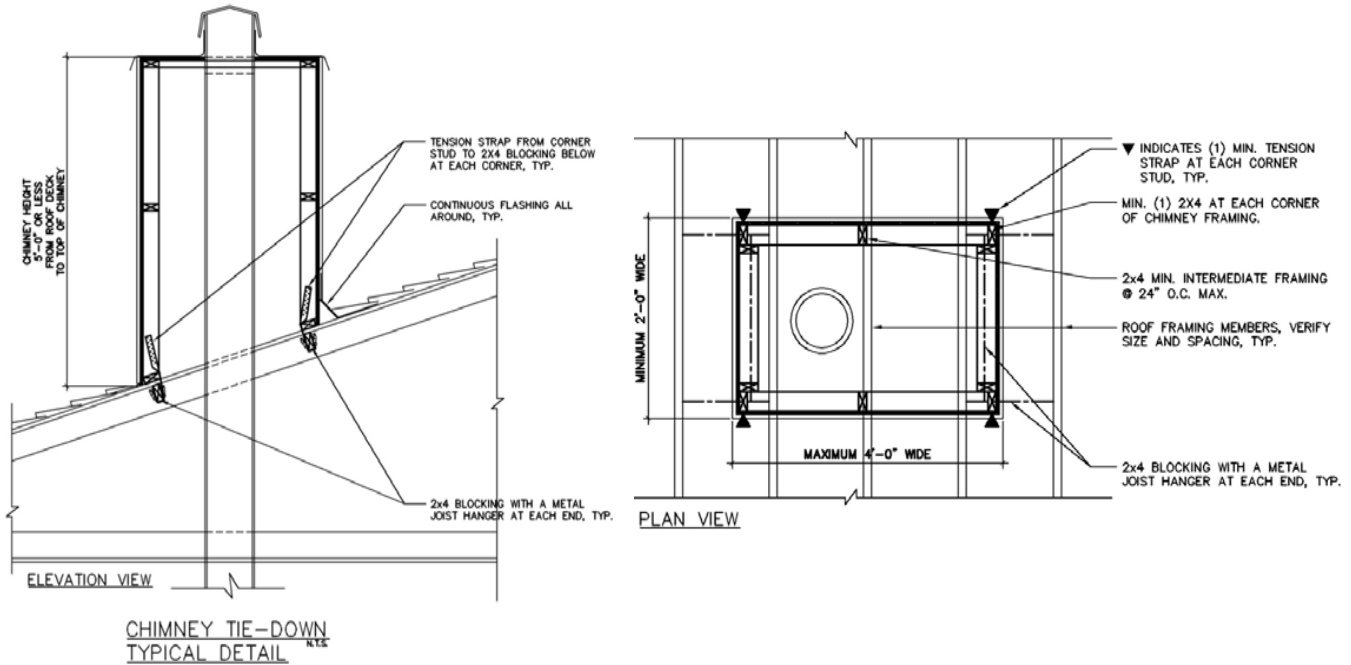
TYPICAL CHIMNEY TIE-DOWN DETAILS
